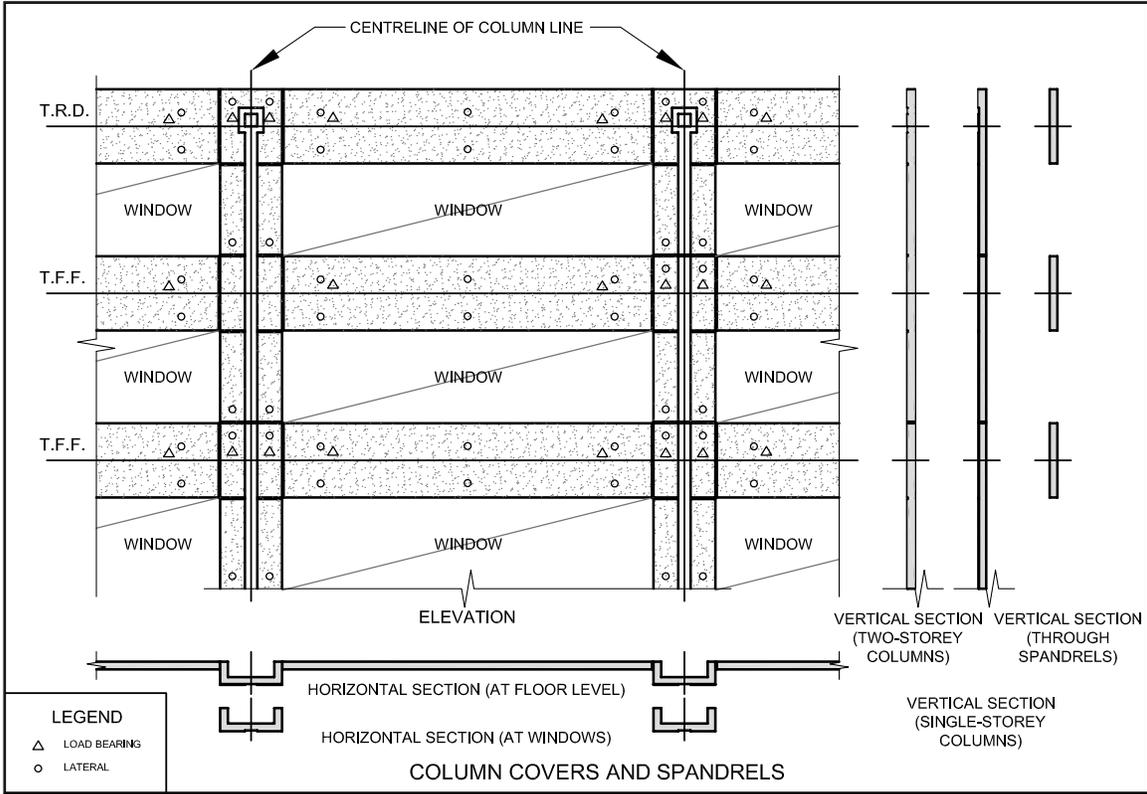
Precast horizontal panels with column covers. Source: M. E. Hachborn Engineering
